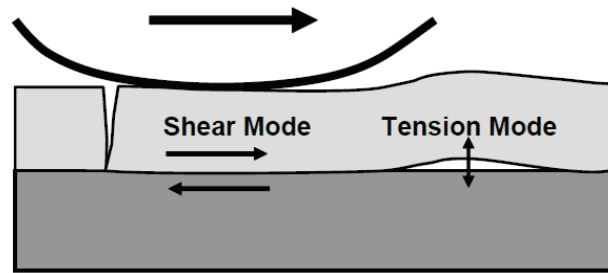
Adhesion stress modes in the upper pavement layers under service conditions (Raab and Partl, 2004)
